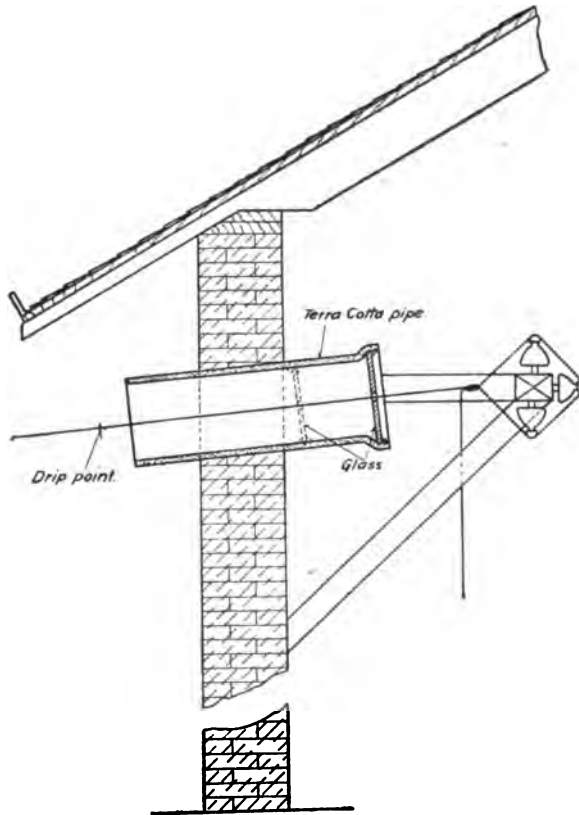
Wall Outlet with a Terra Cotta Pipe.
